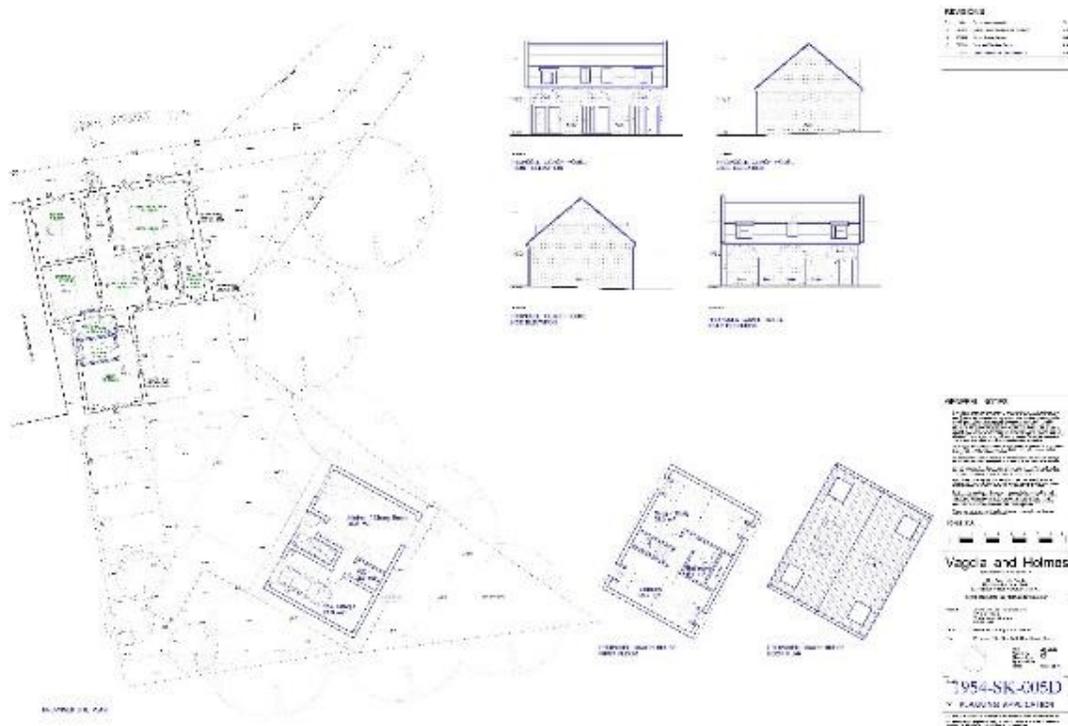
Redeveloped Outbuilding / Proposed Coach House Drawing ref: 1954-SK-005D
